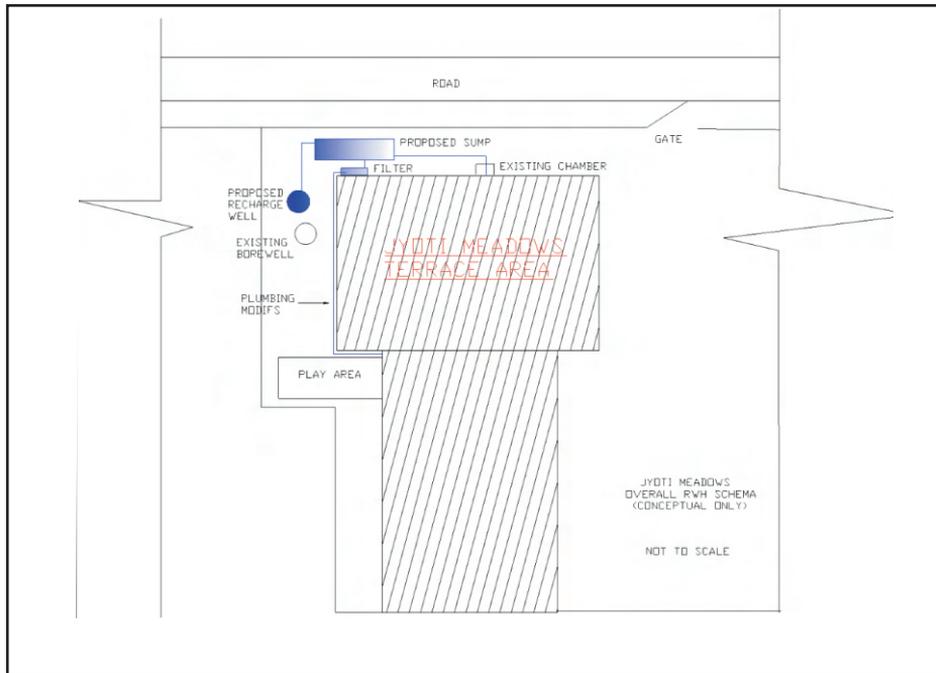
Plan for rainwater harvesting for Jyoti Meadows
